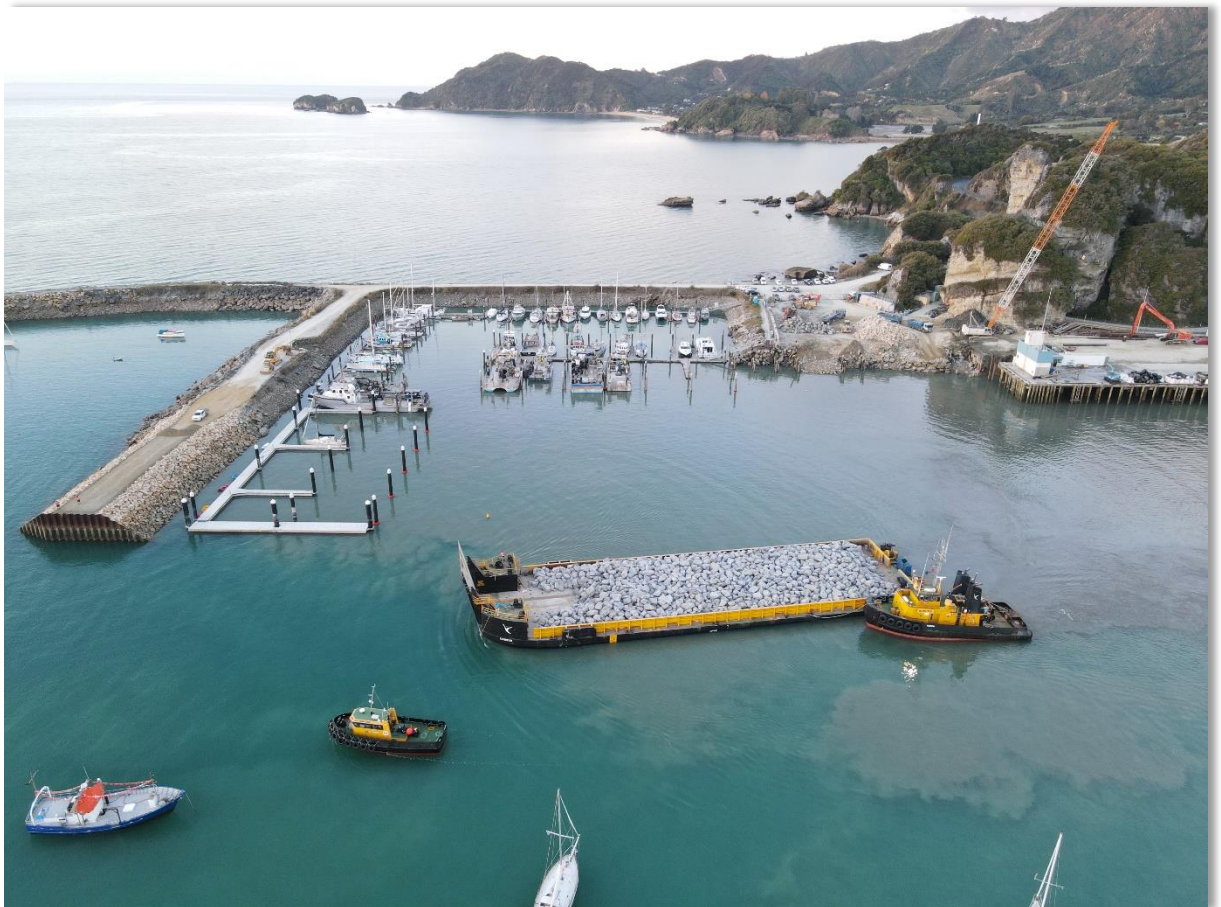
New sheet pile wharf and Ramp installation with rock barges
